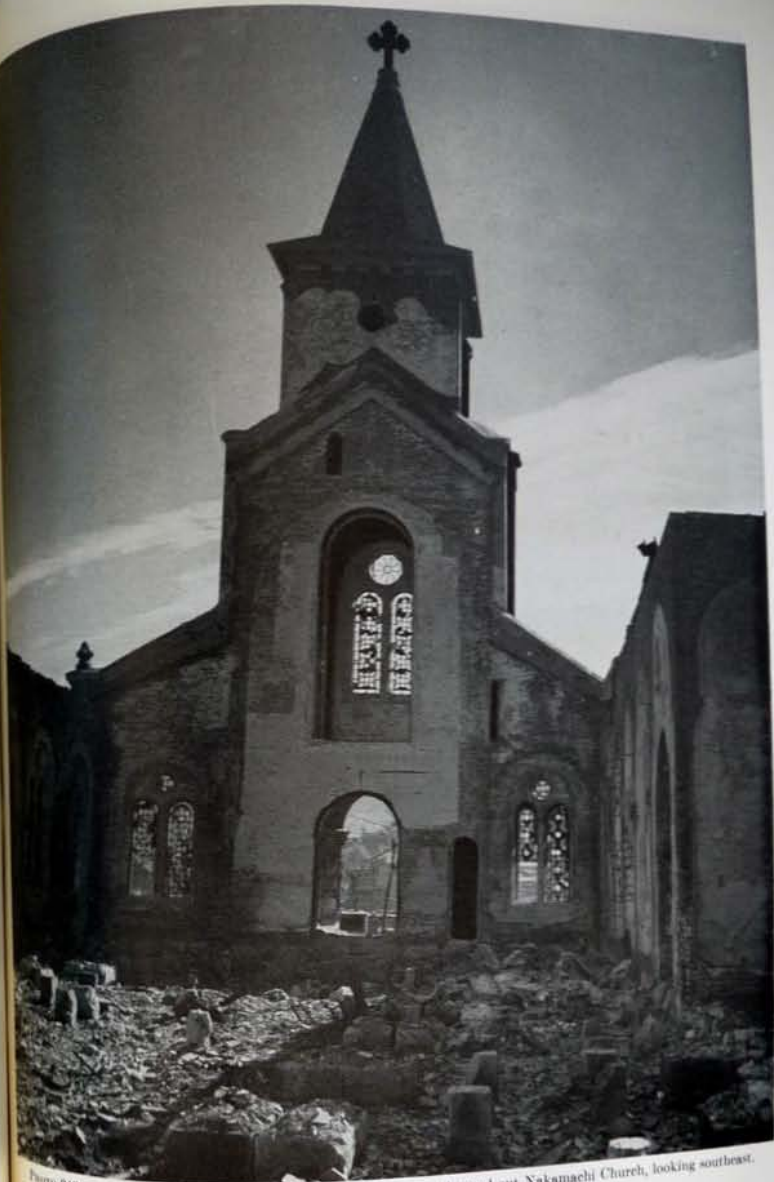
8,800 feet from GZ. Group 70, interior view of burned-out Nakamaehi Church, looking southeast.
